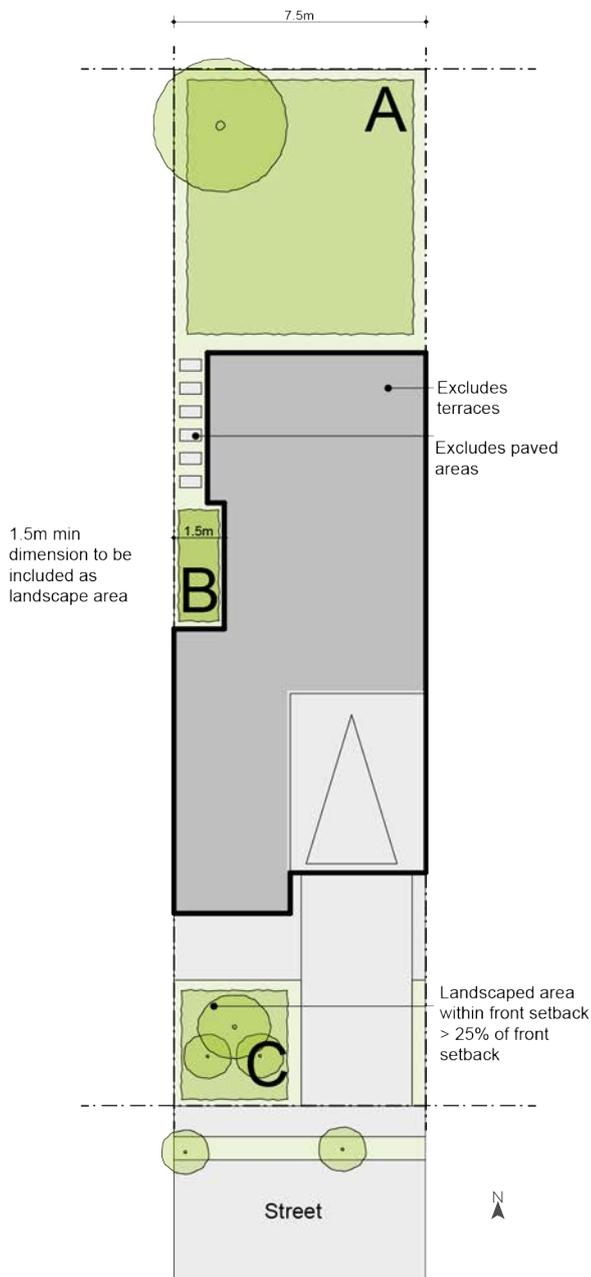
Landscaped areas distributed around the site. The minimum dimension ensures the space is sustainable for substantial planting
